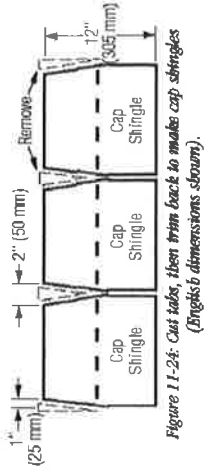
Cut tabs, then trim back to make cap shingles (Shingle's dimensions shown).
